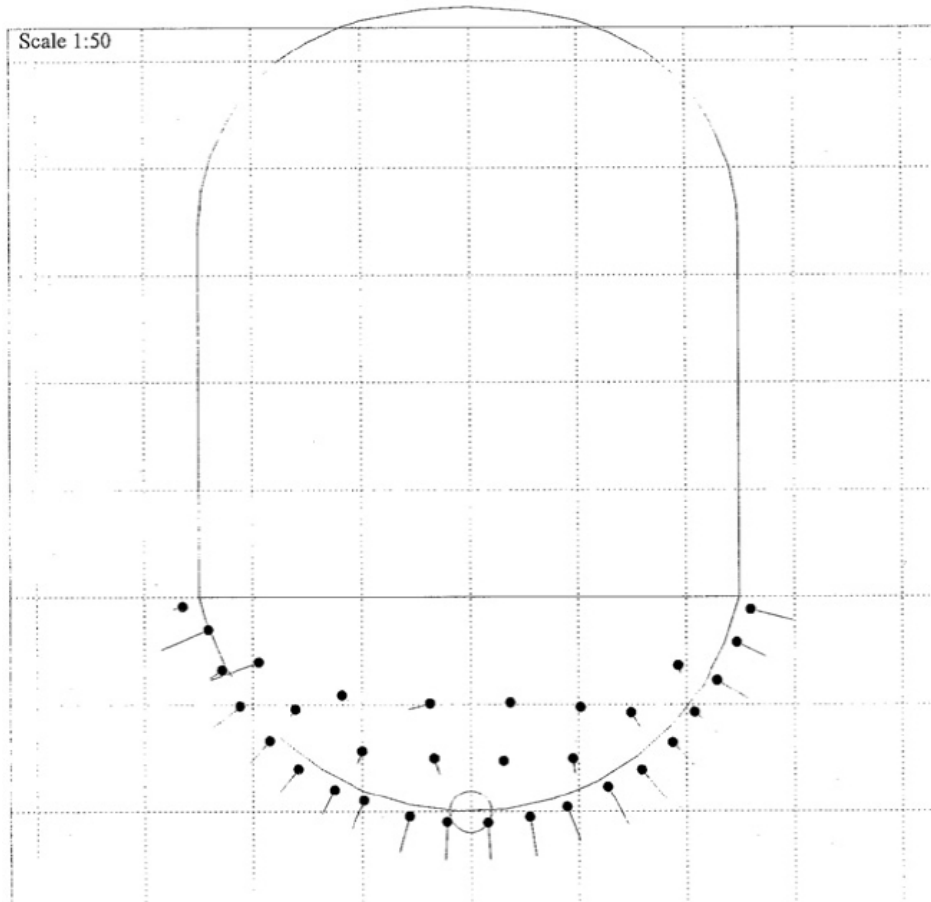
Actual drilling plan of bench round 37, section 0/45-0/50.
